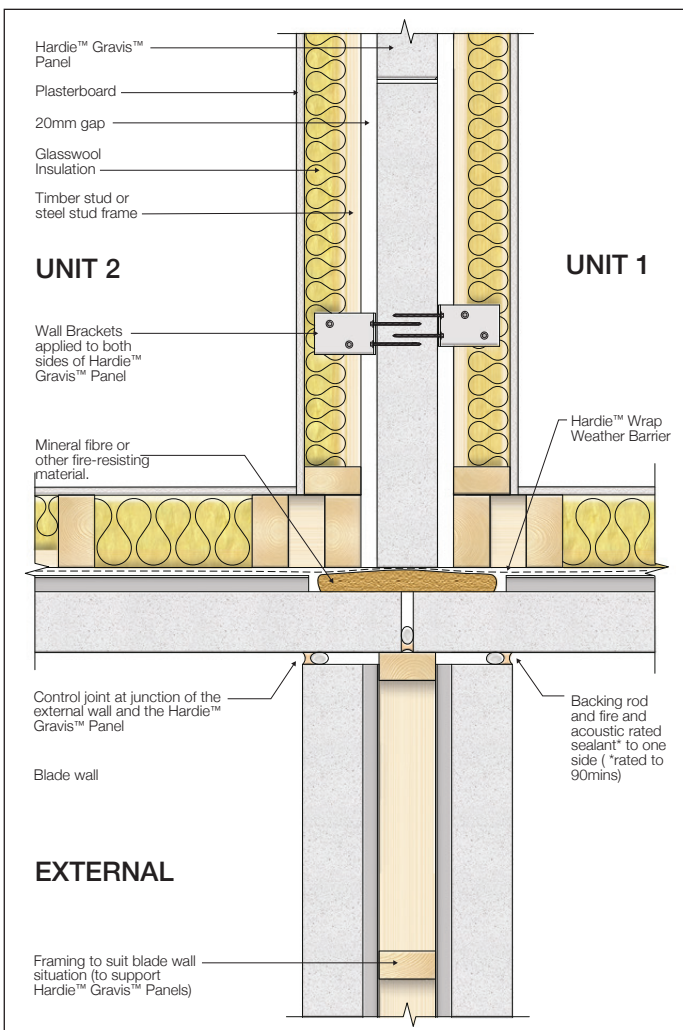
BLADE WALL JUNCTION FOR VERTICALLY ALIGNED INTERTENANCY DISCONTINUOUS WALL
